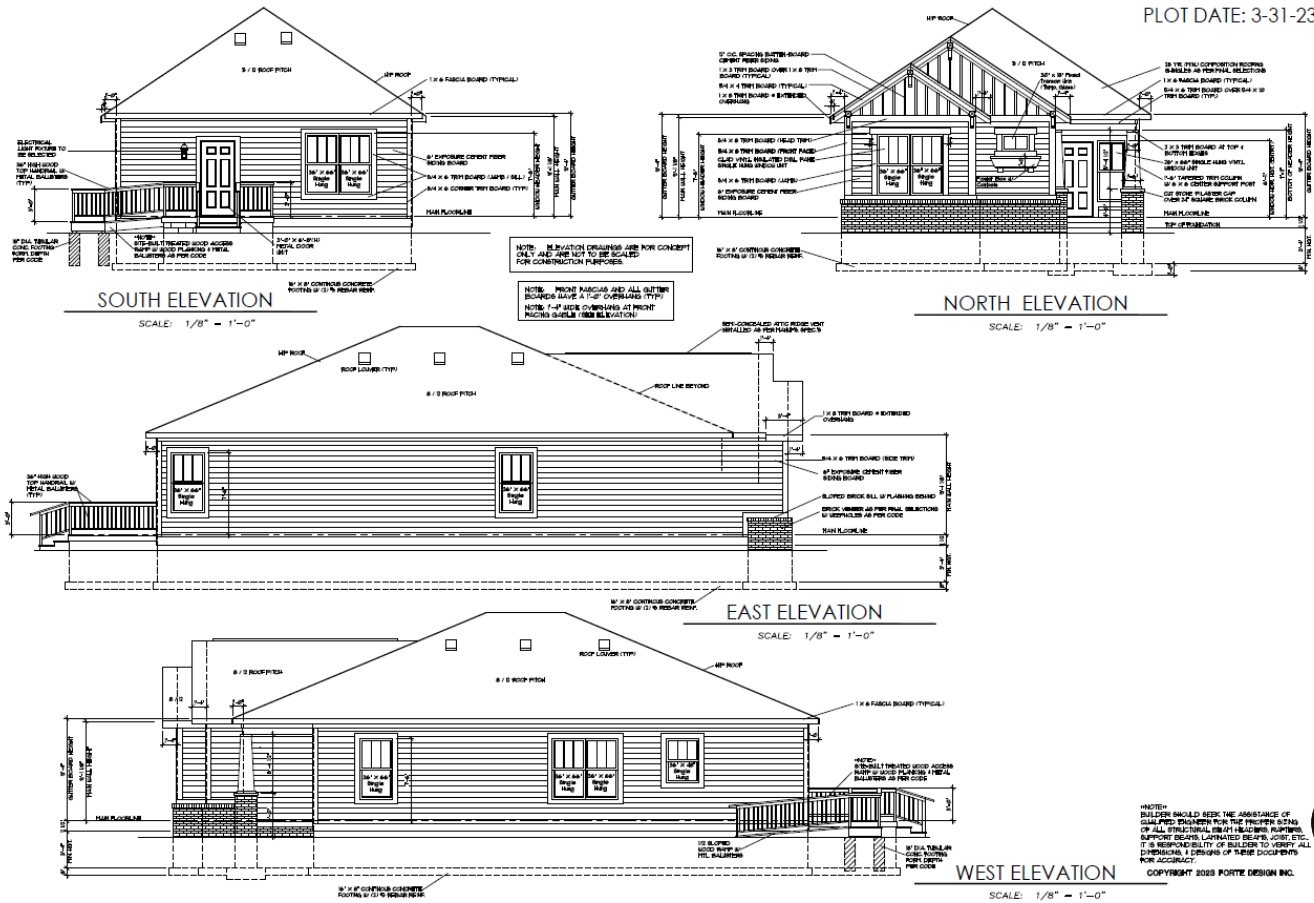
Elevations for the proposed single-family dwelling, if this variance is approved.
